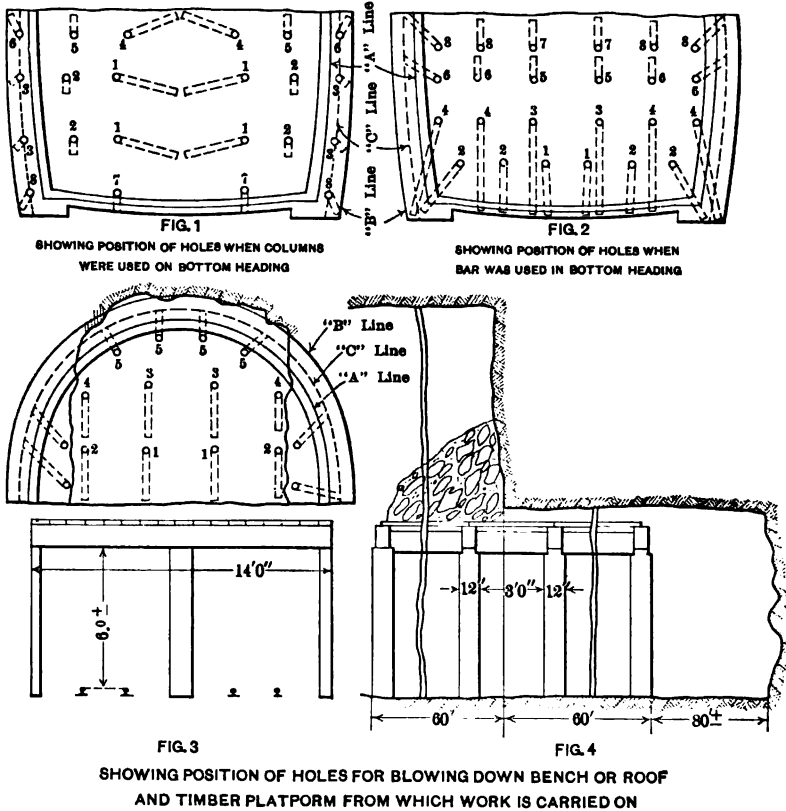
Hunters Brook Tunnel. Method of excavating tunnel with bottom heading. Method of using timber platform for upper portion of tunnel.
